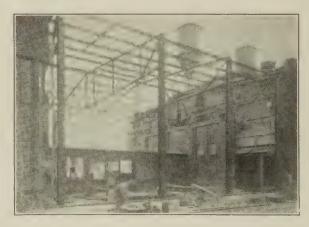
Welded Trusses Erected in Position between other Buildings
